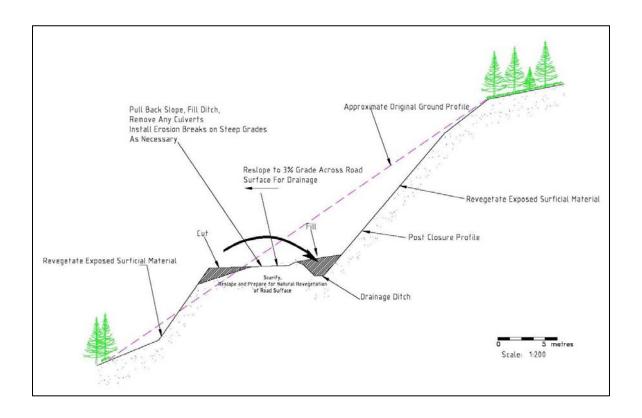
Haul Road and Site Road Typical Reclamation Cross-Section
